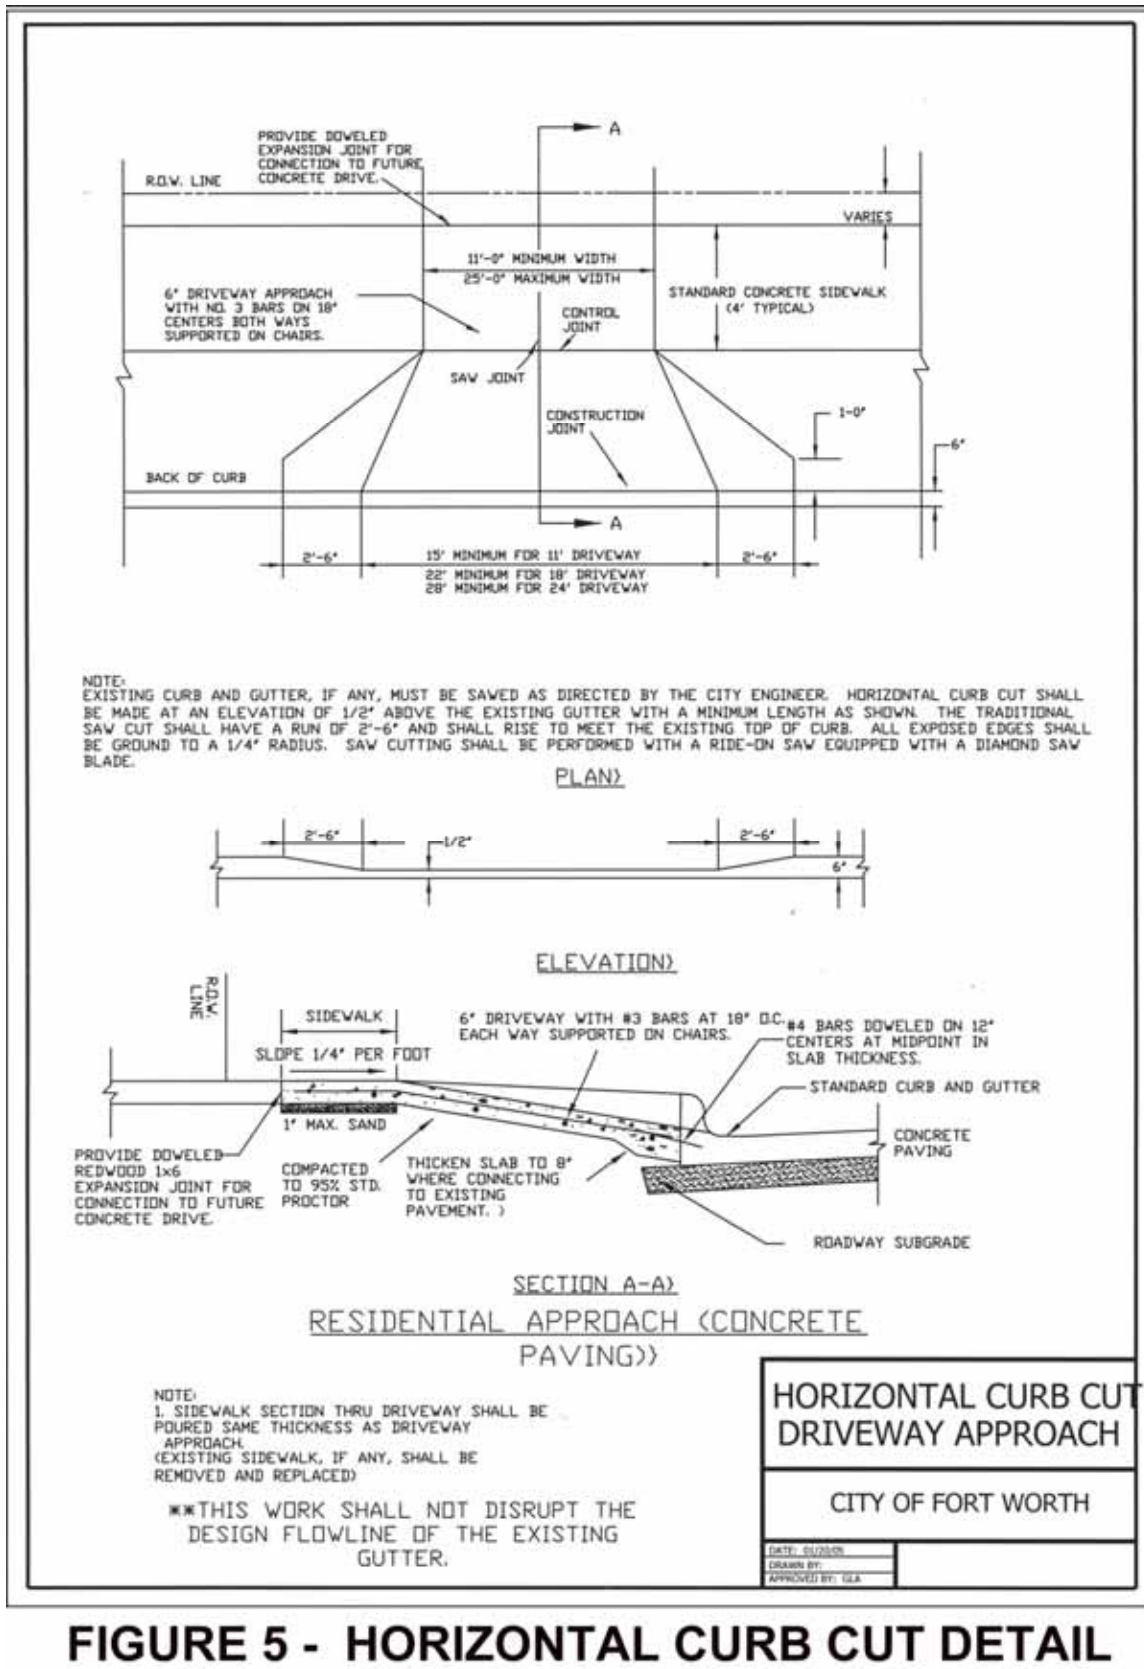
HORIZONTAL CURB CUT DETAIL
